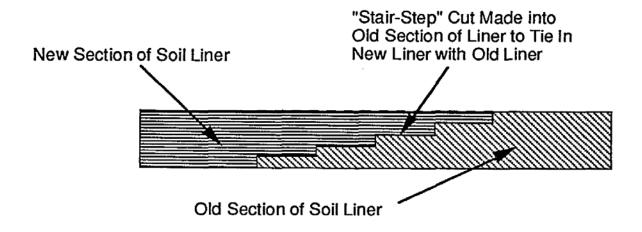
Constructed Soil Liner Stair-Step Tie-in Detail
